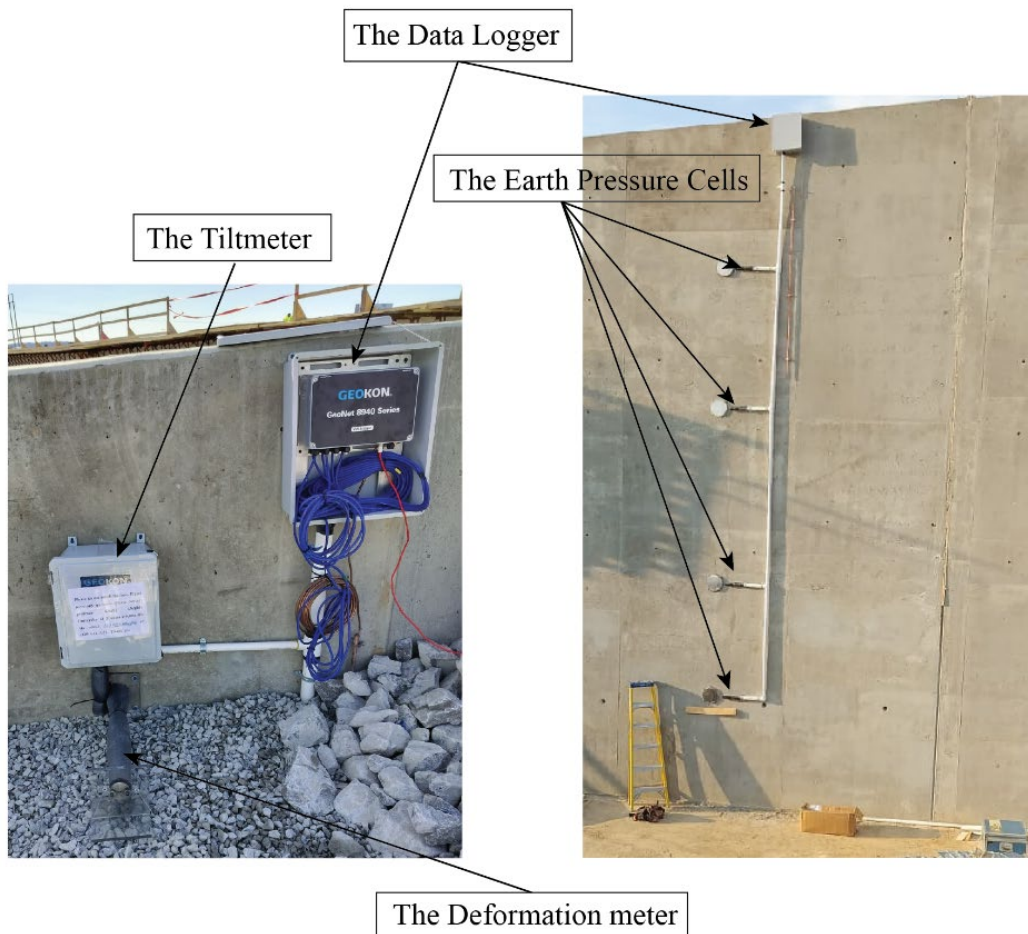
Construction of the sensors, and the datalogger at wall No.6 from wall STA. 2+97.18 to wall STA. 3+61.84.
